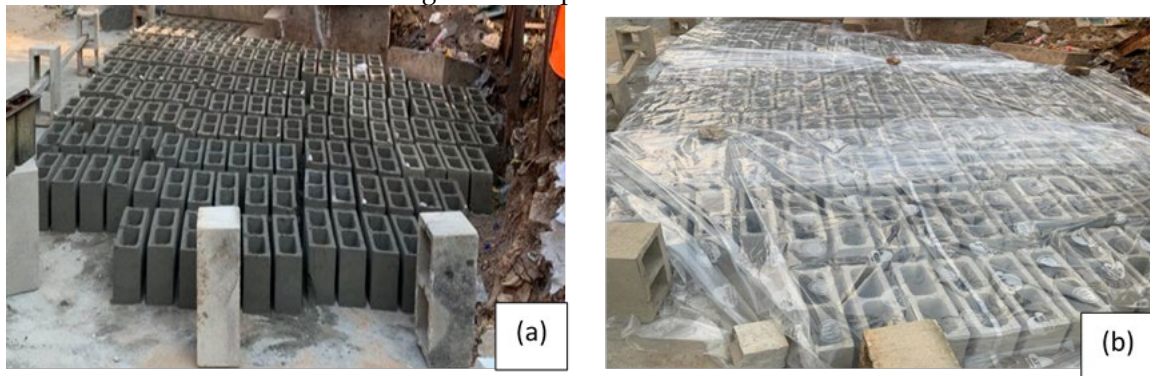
Block samples (a) freshly moulded blocks (b) blocks under curing
